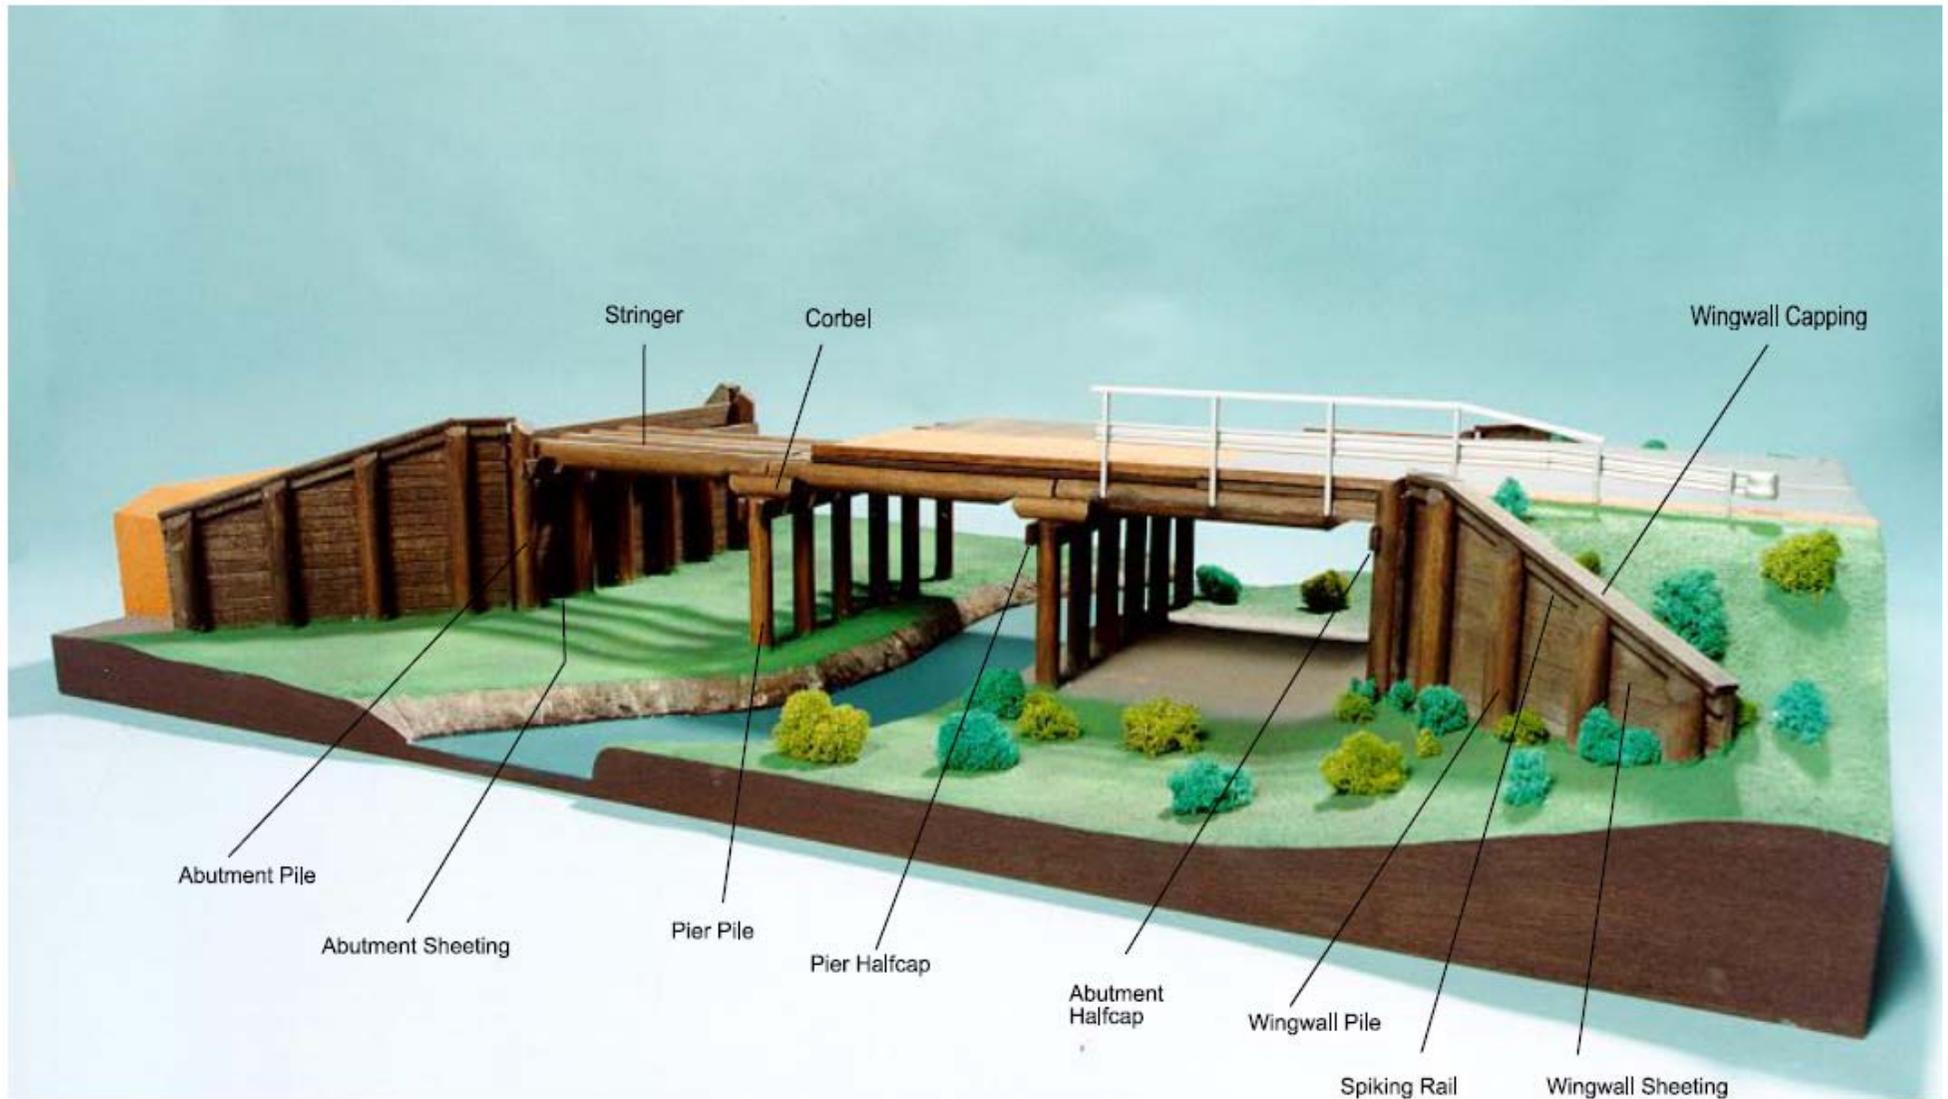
TYPICAL TIMBER BRIDGE STRUCTURE
